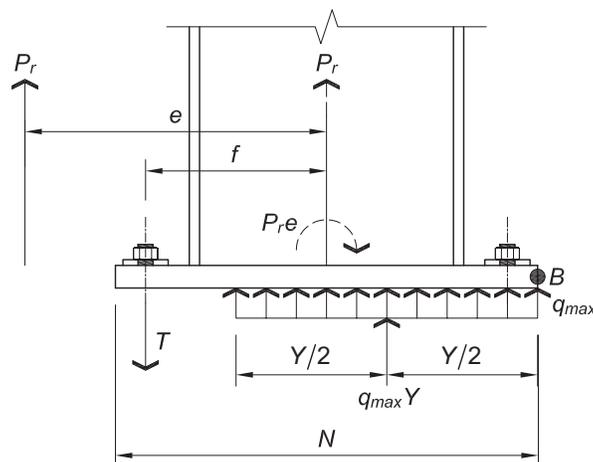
Tension force falling outside of anchor rod group extents.
